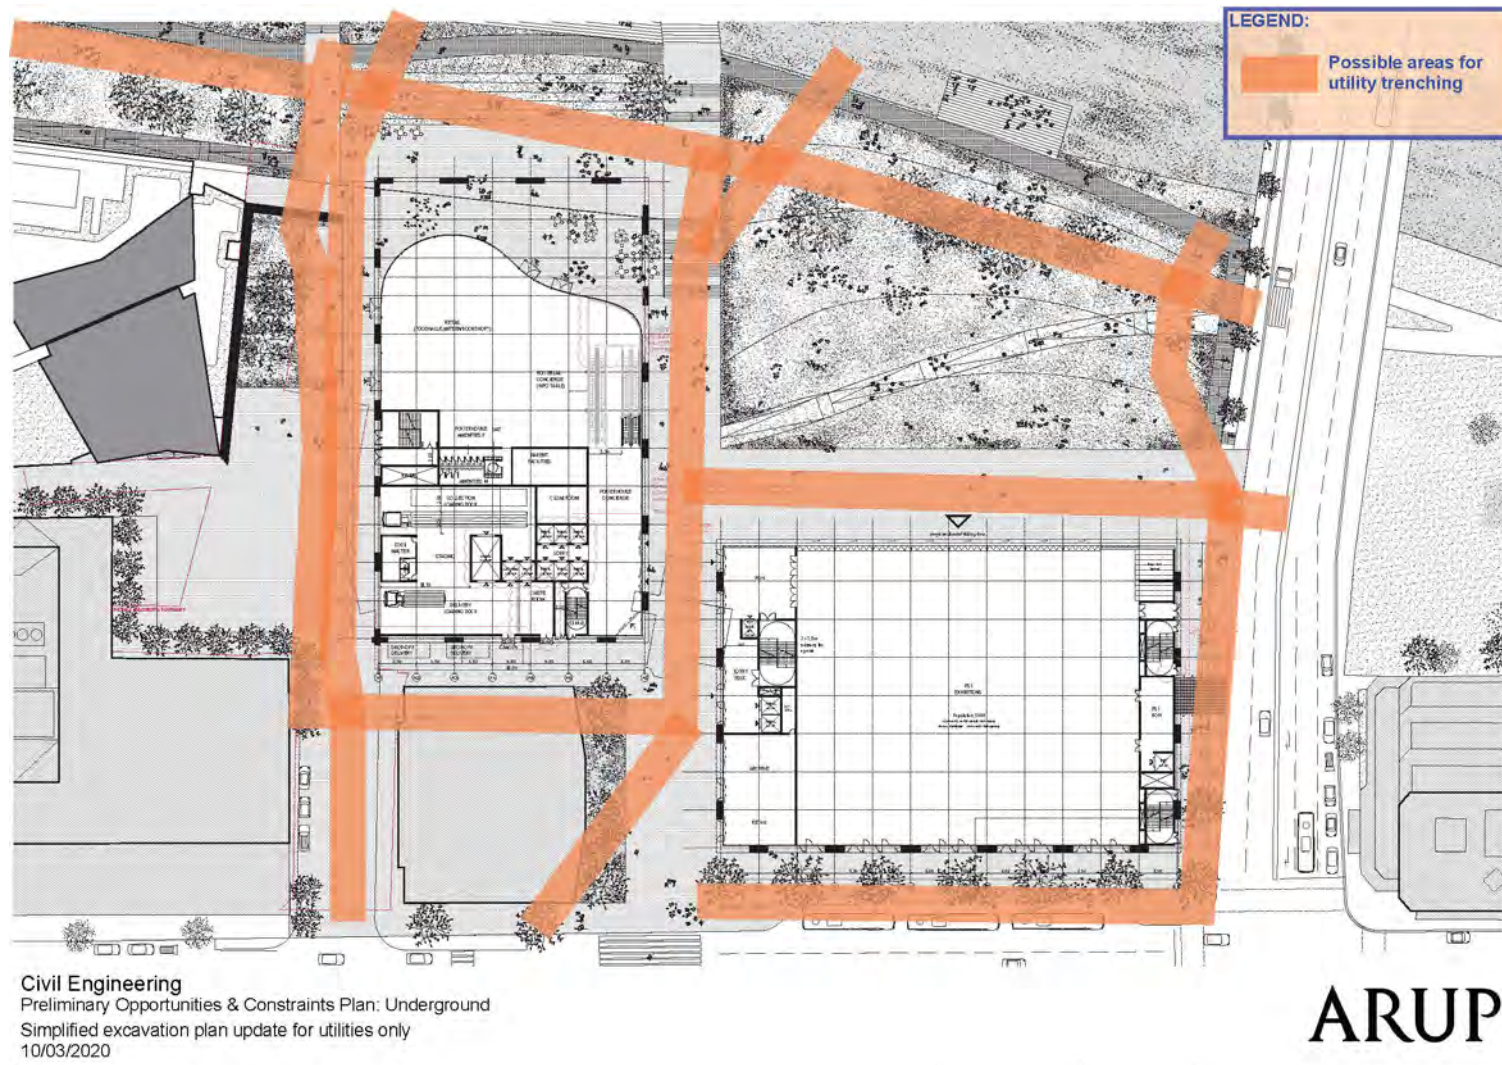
Potential Utilities Trenching Plan (Arup, 10.3.2020)
